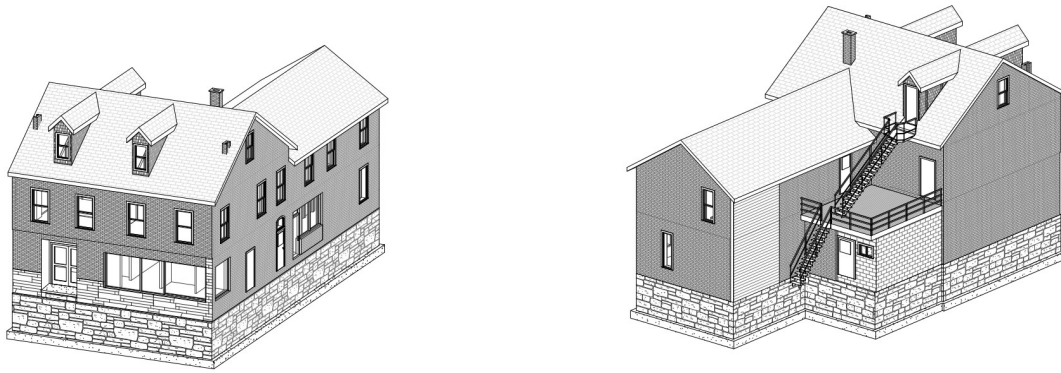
Drawings of 164 Bathurst Street (present-day 164 Bathurst Street), illustrating the building's northeast (left) and southwest (right) corners, prepared by T. Smith Engineering, 2019. (City of Toronto Building Records.)
